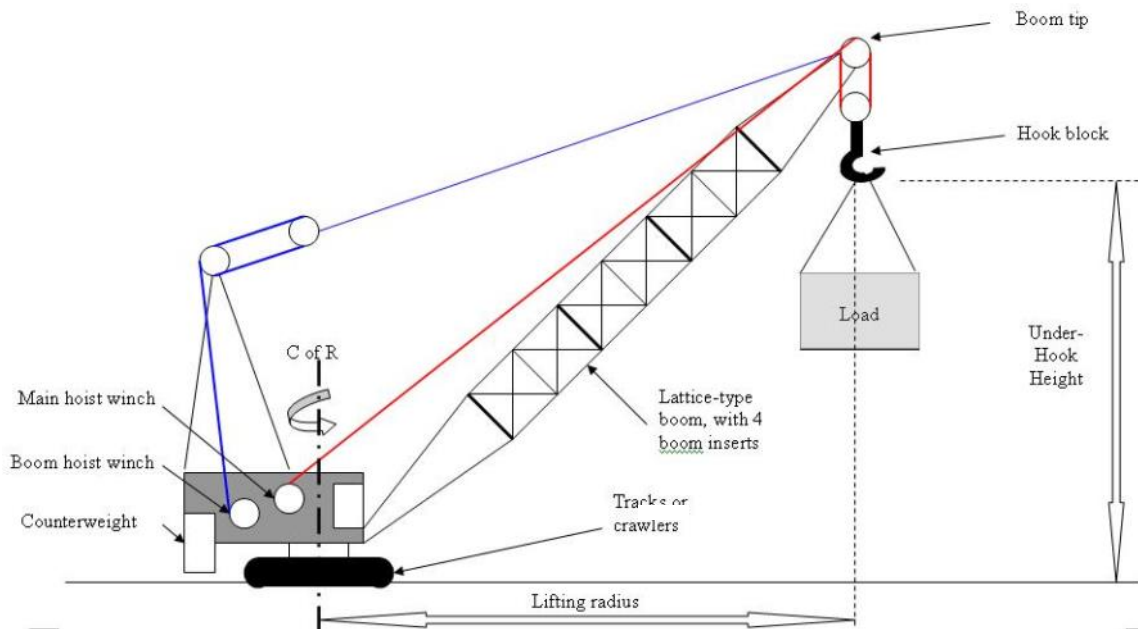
Crawler Crane, Showing Key Components and Dimensions
